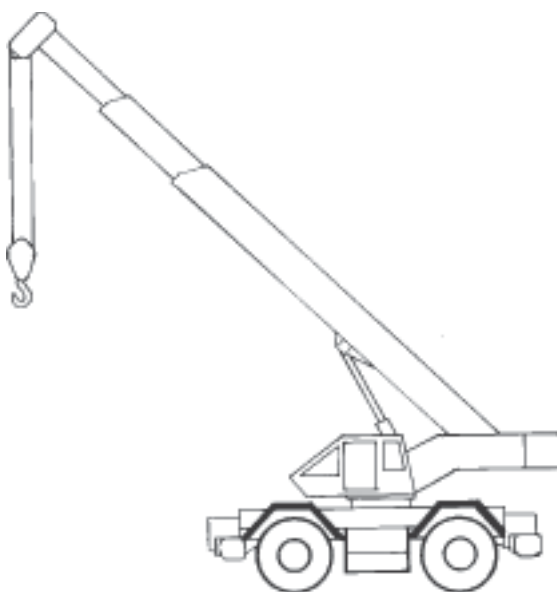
Wheel-mounted telescoping boom with slewing upper structure
